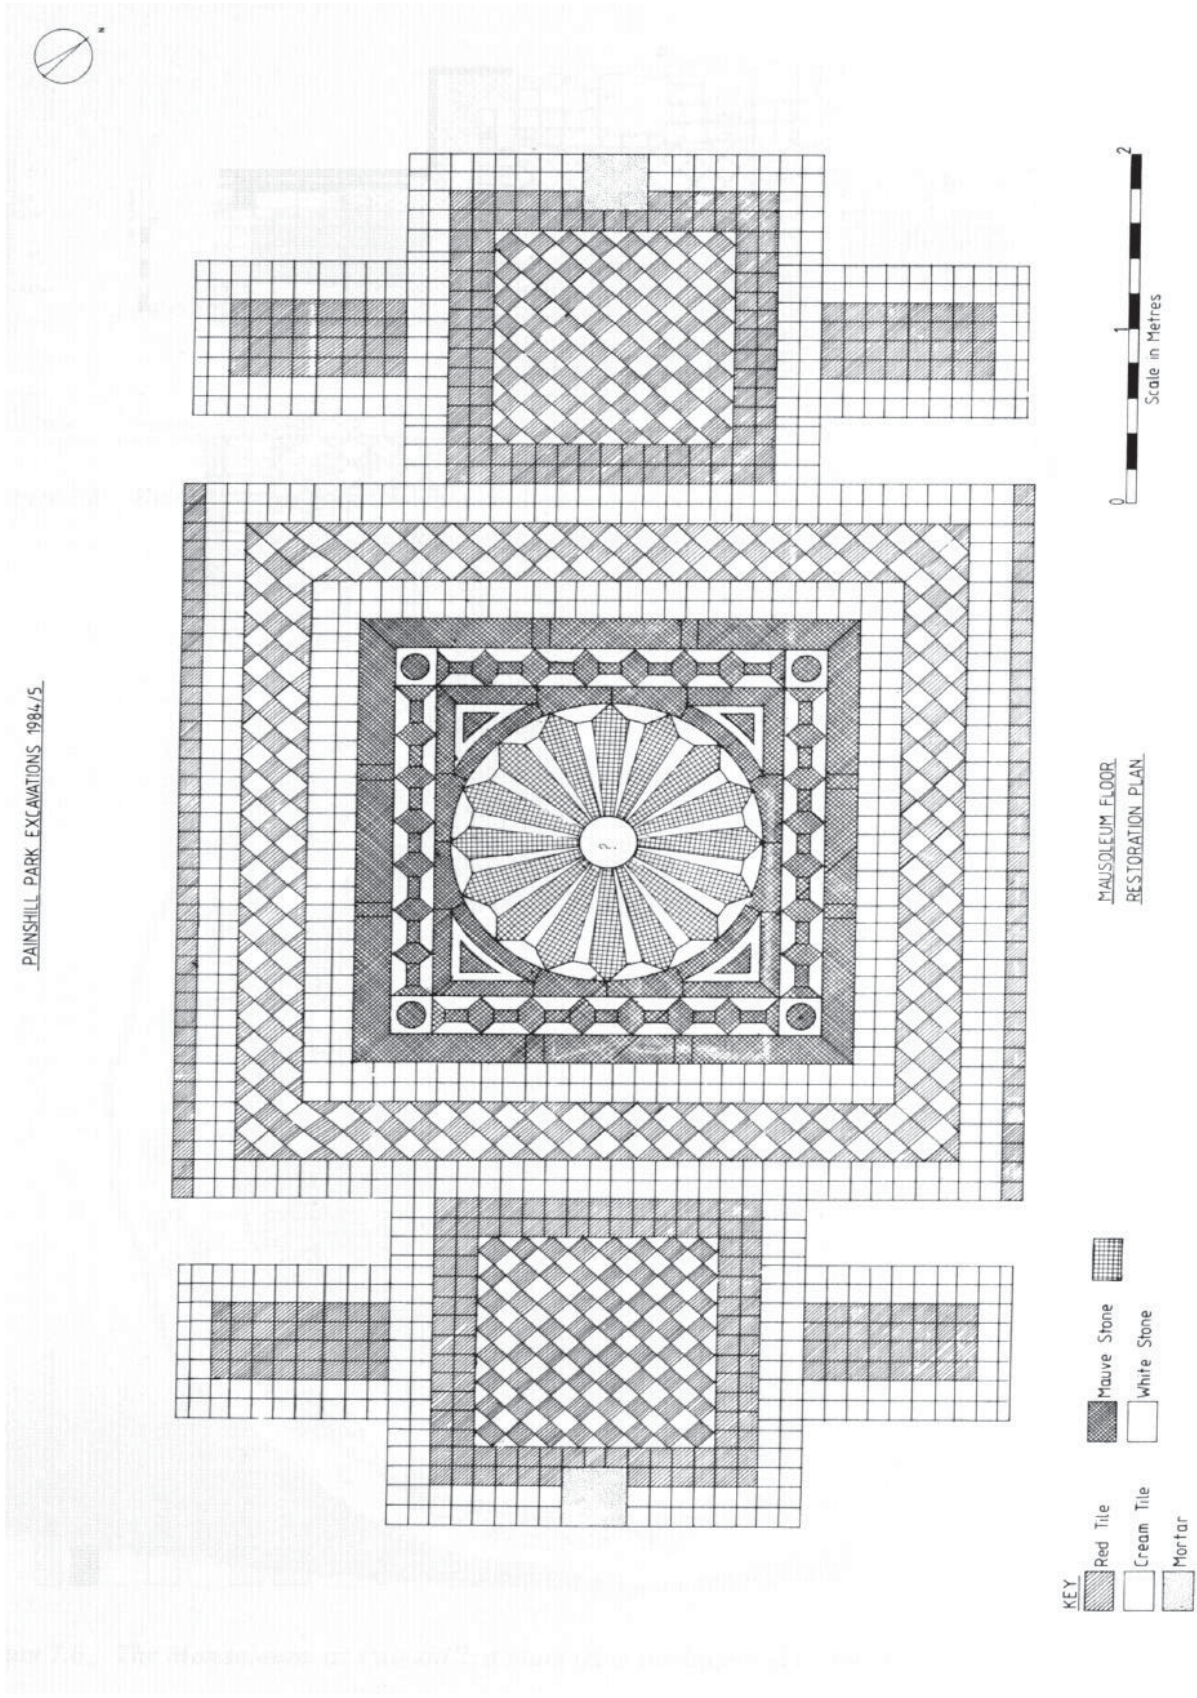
Design of the Mausoleum floor, Painshill. Based on excavated plan
